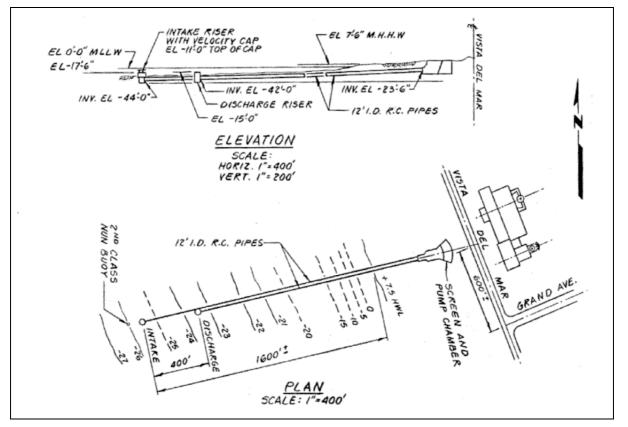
Plan view and elevation of the SGS offshore intake system.
